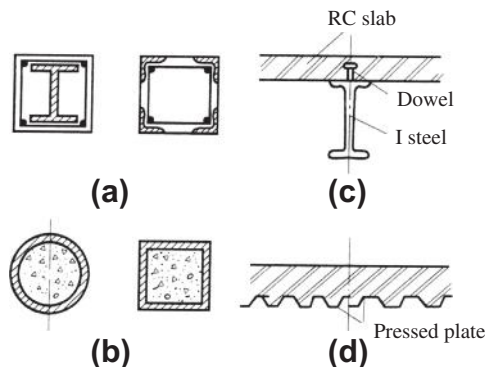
Composite sections of shape steel-concrete: (a) shape steel, (b) tube (c), composite beam, (d) pressed plate
